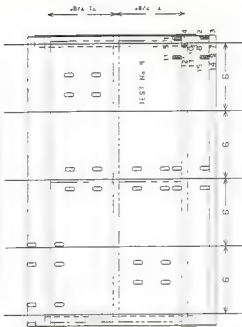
LVDT Locations (Third Bridge - Test No 4)
